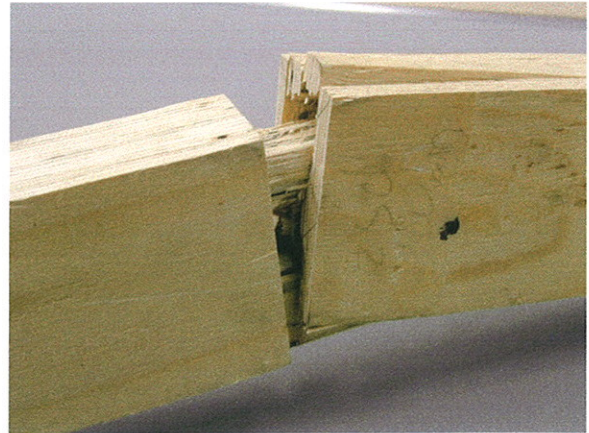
Fracture of test type A(b) beam with good adhesion between rods and LVL.
